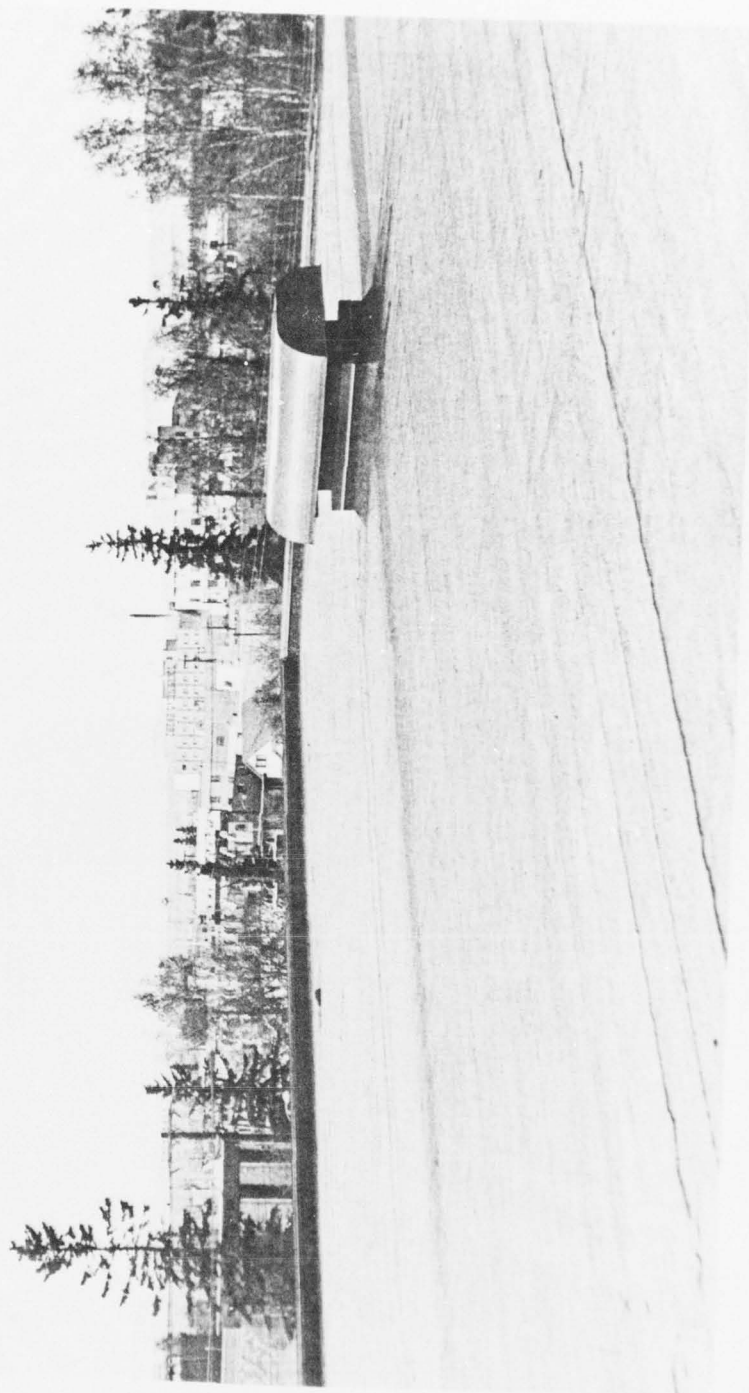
View Looking Northwest Across Roof, 11 May 1978.
